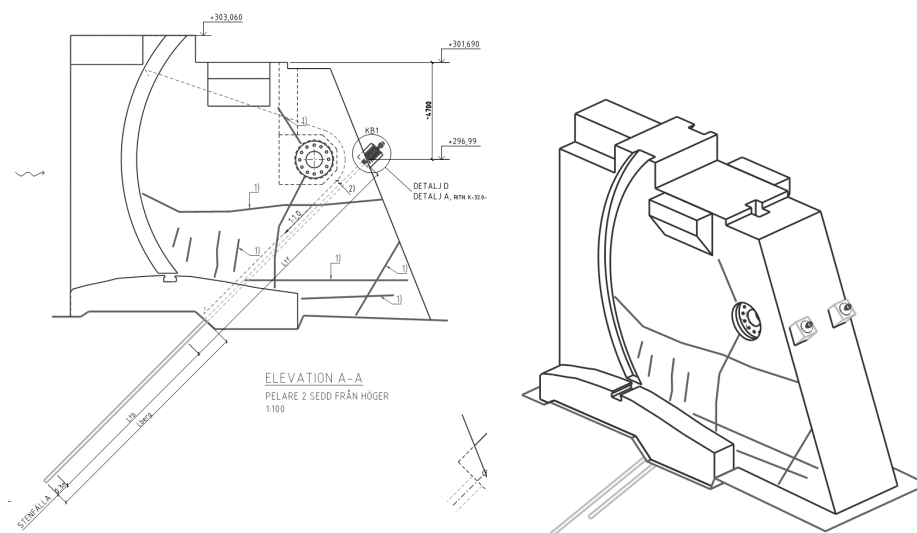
New pre-stressed anchors that increase the stability and secures cracks 1) in the pier.
